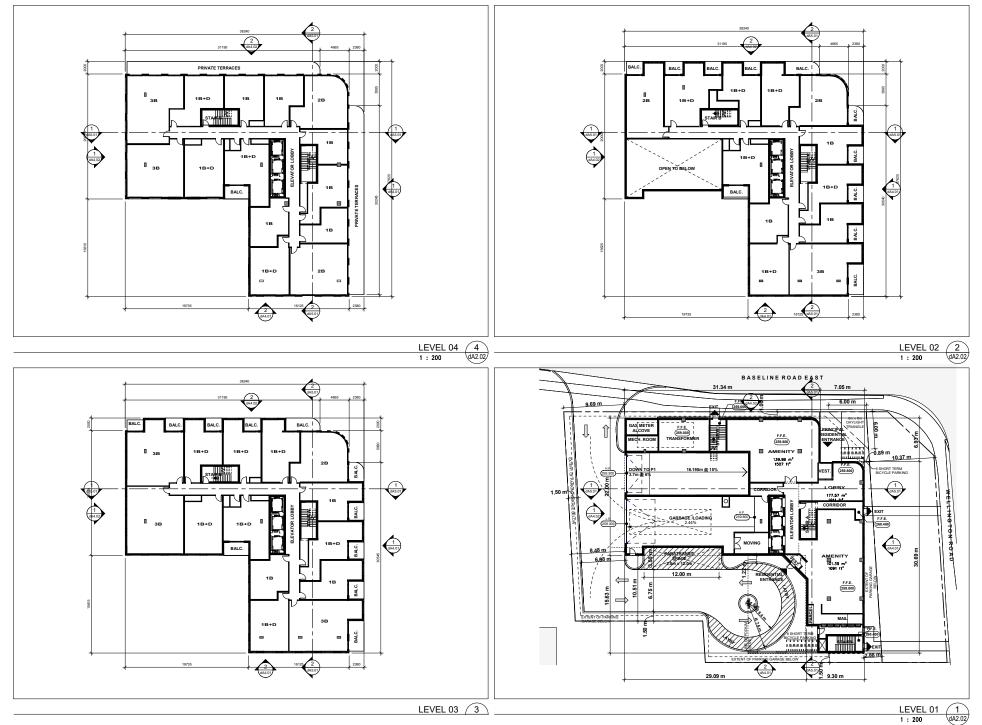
Floor Plans prepared by Kirkor Architects and Planners
